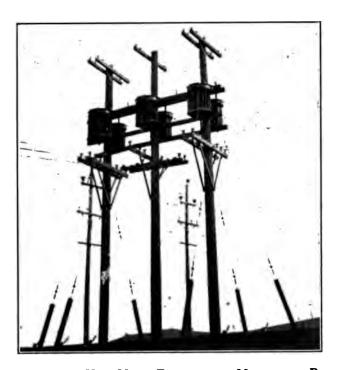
11,000-VOLT MOTOR TRANSFORMERS MOUNTED ON POLES
